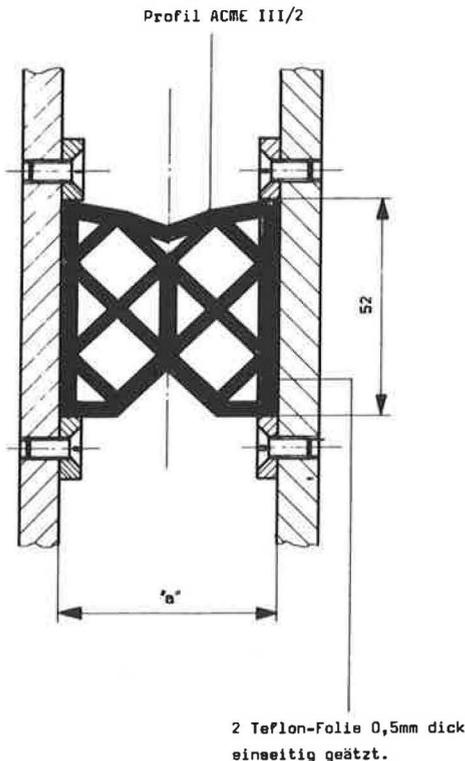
Swiss-German compression seal utilizing 5 mm of Teflon bonded to the elastomer and 5 mm of Teflon bonded to the steel interface of a longitudinal joint. Stops are affixed to top and bottom to resist floating or migration. Used to accommodate distance change between interfaces, differential longitudinal movement and severe vibration from traffic loading on longer spans.
